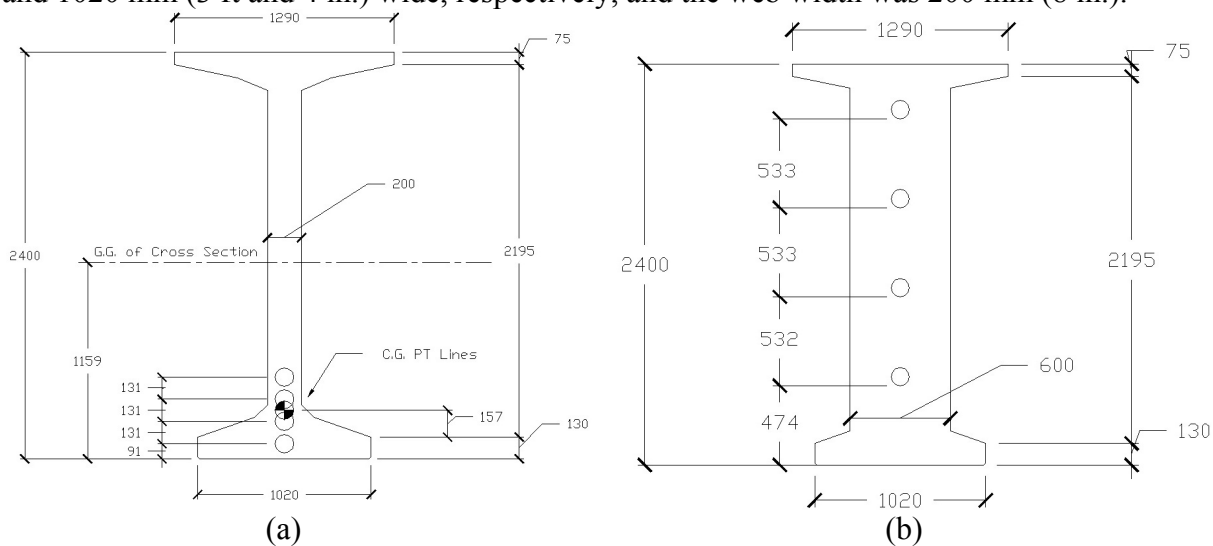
Girder cross-sections: (a) midspan, (b) anchors (1 in. = 25.4 mm).
